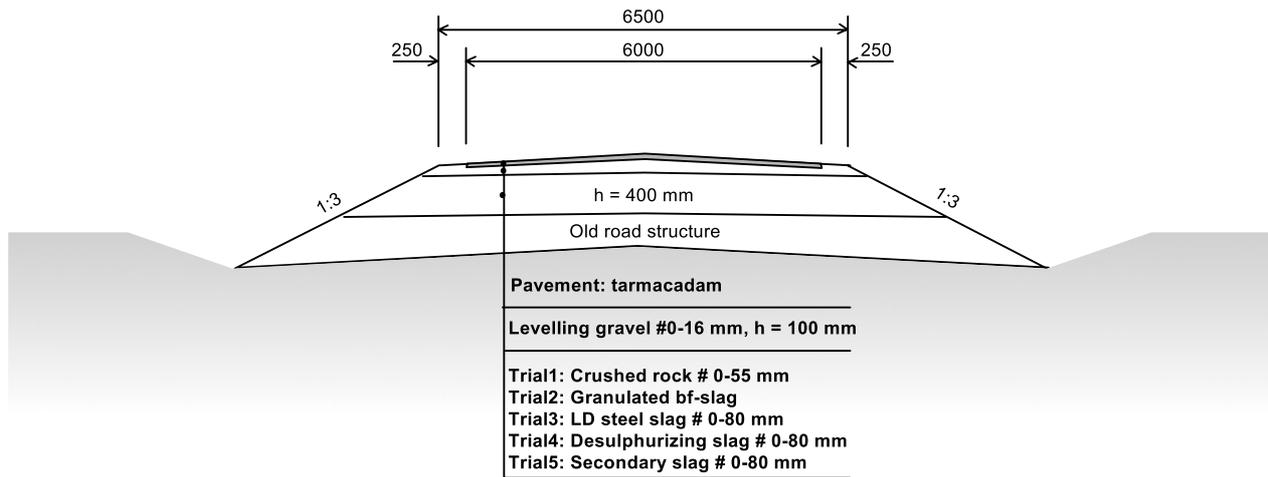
A schematic cross-section of test constructions with massive slag structures.
